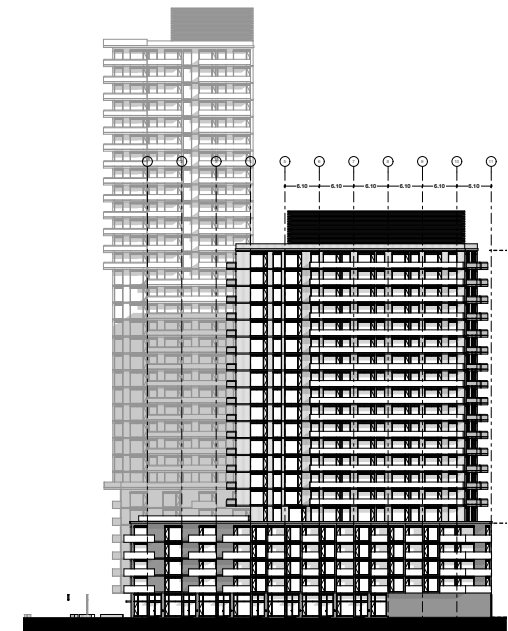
South elevation, Buildings D & C (TACT Architecture, 2024)
